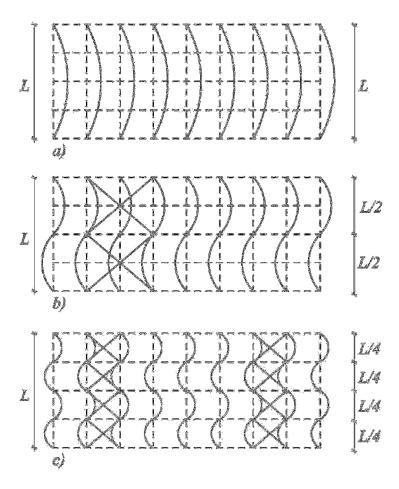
Different buckling modes of primary roof members dependent upon the bracing configuration that is found, where a) involves there being no bracing in the plane of the roof, the buckling length being equal to L, b) the wind trusses reducing the buckling length to L/4.
